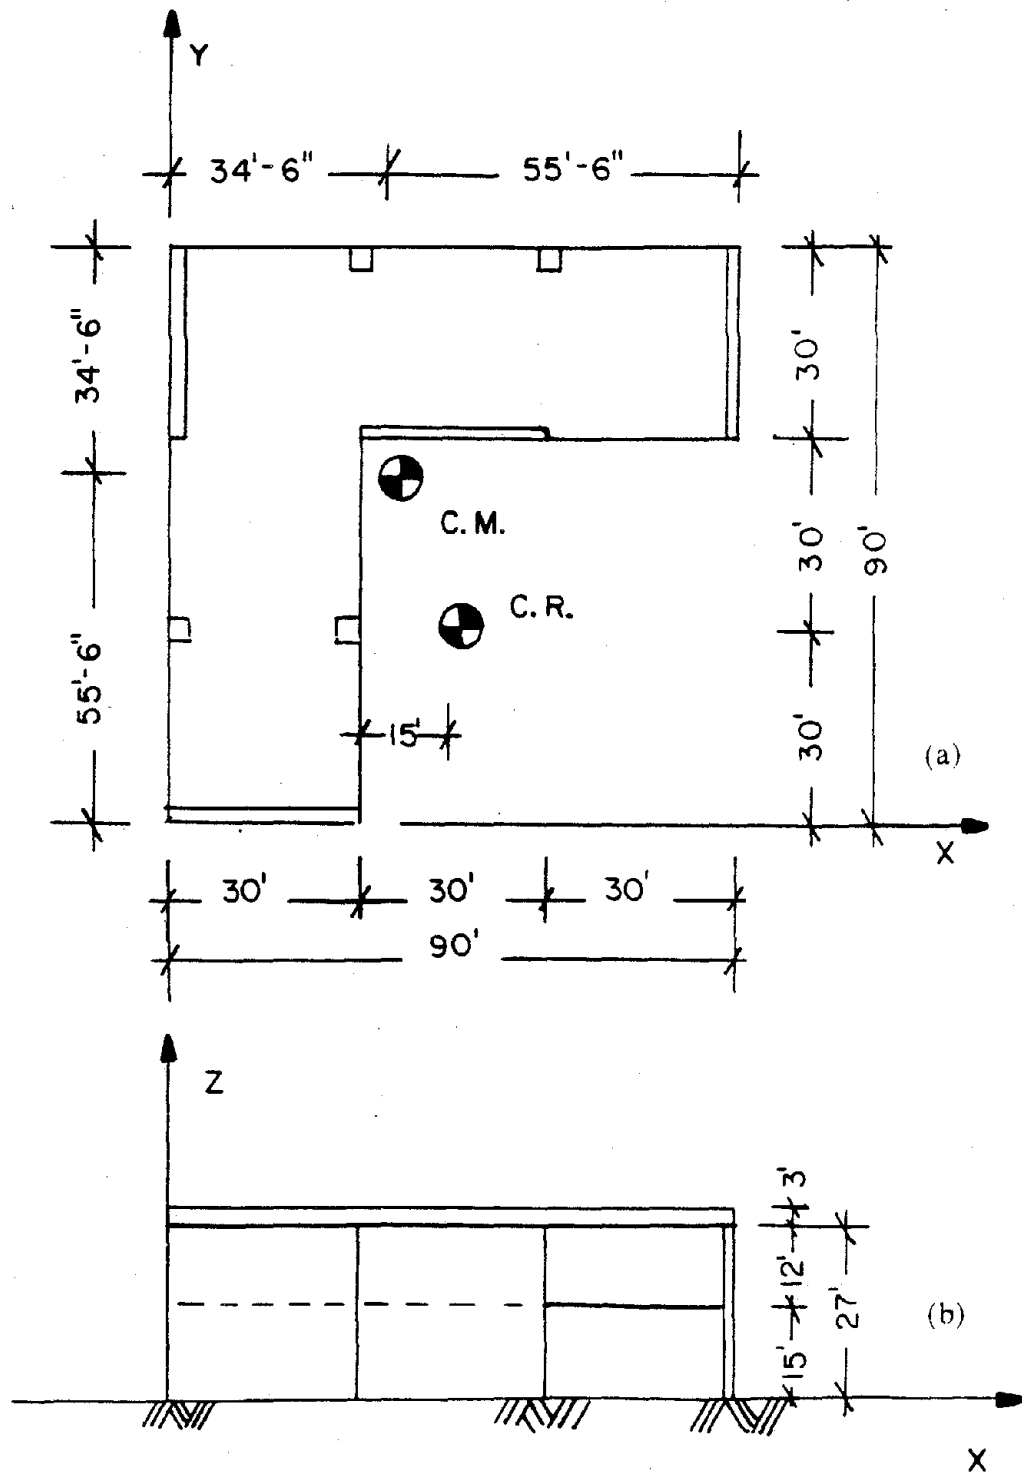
Two Story Unsymmetric building: (a) Plan, (b) Elevation
